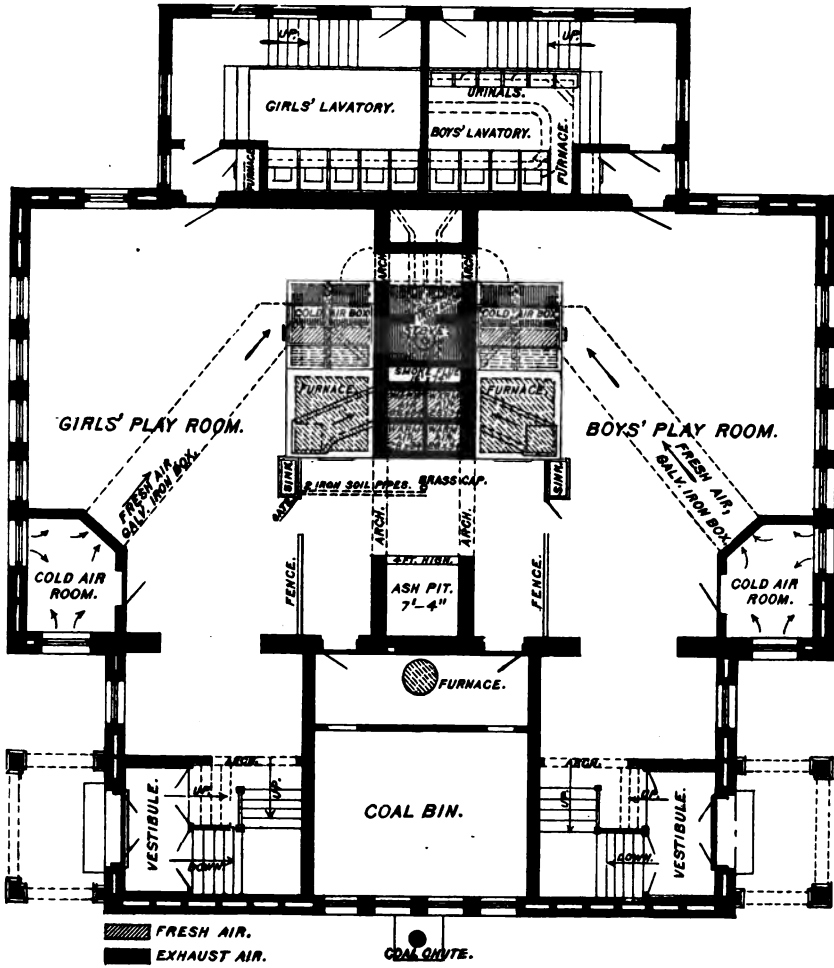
Quinsigamond schoolhouse, Worcester, Mass. (Basement plan.)
